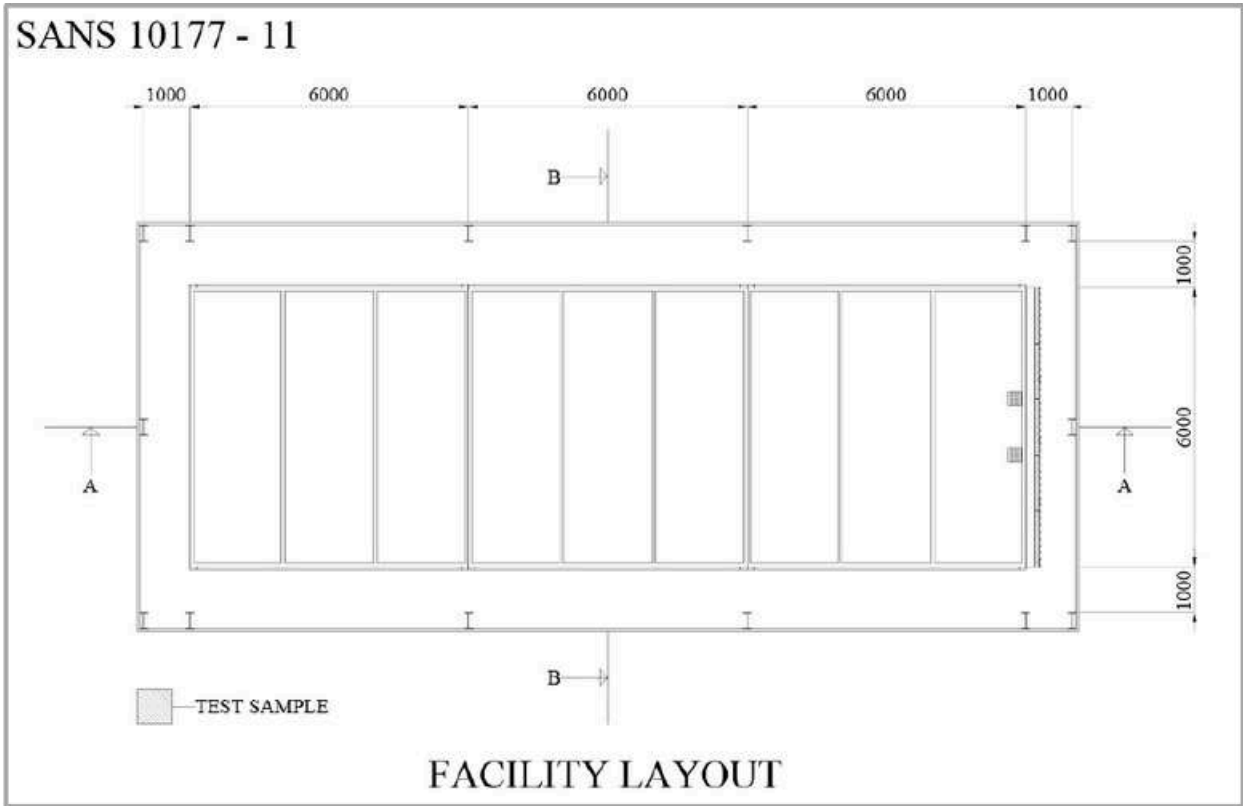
SANS 10177-11 facility plan view for vertical test
